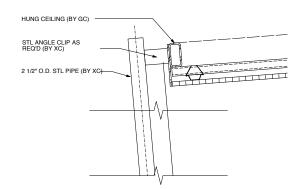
EXHIBIT WALL, DETAIL AT TOP (DROP CEILING) SCALE: 1-1/2"= 1'-0"
